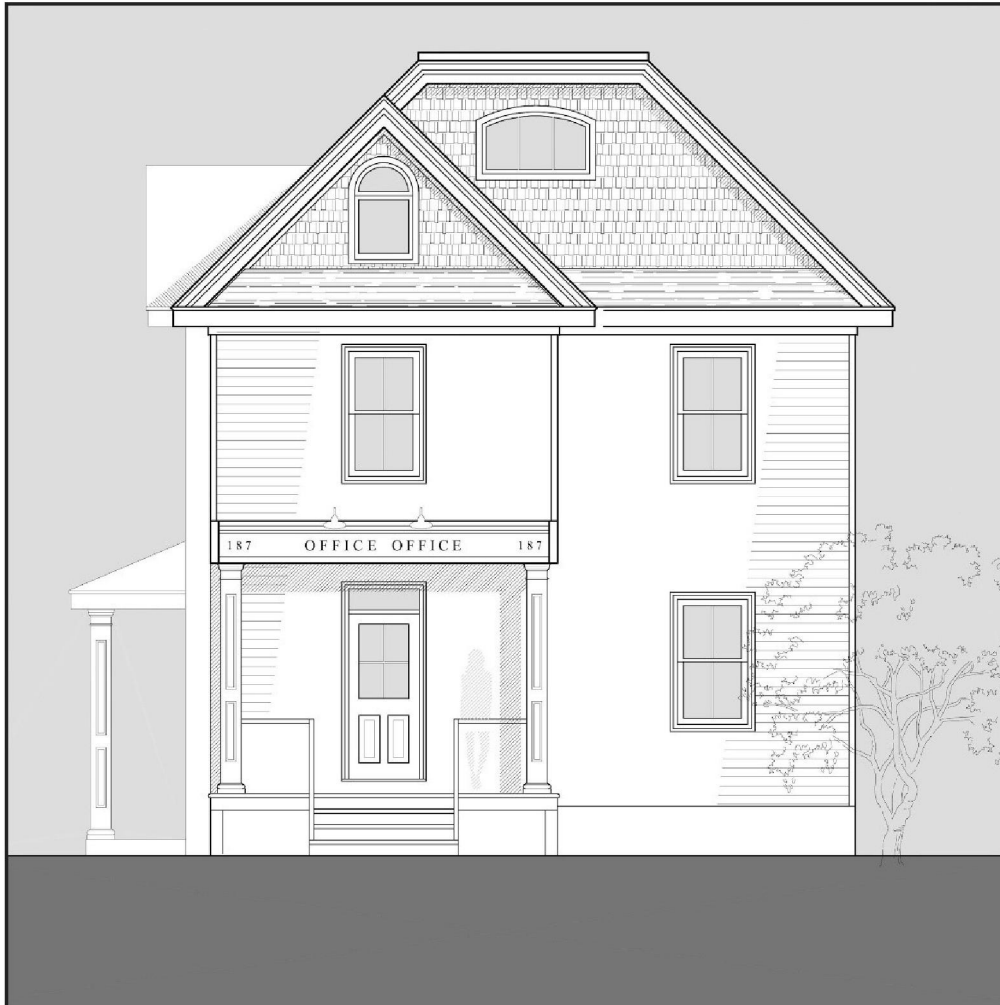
Elevation drawings of the proposed house at 187 Wharncliffe Road North (TD-BAS Inc., dated May 2021).
